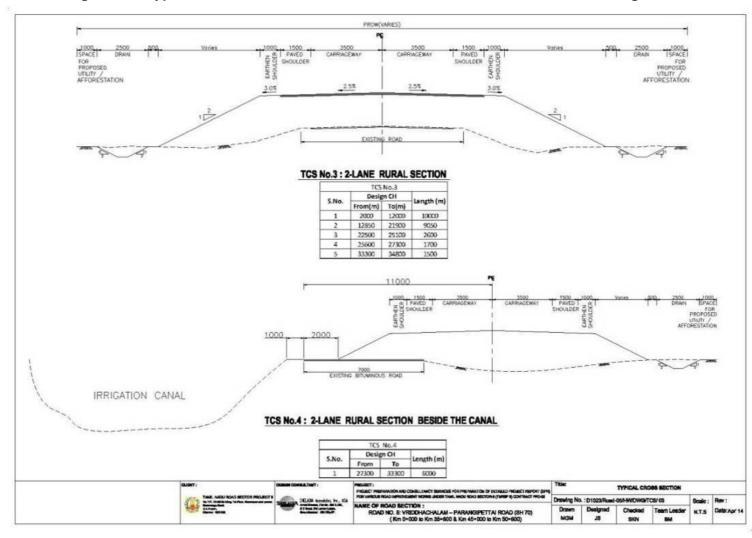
Typical Road Cross Section in Rural Area for Vridhachalam- Bhuvanagiri Road
